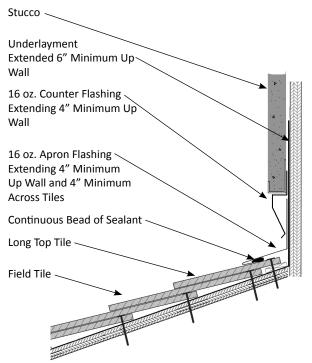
Counter Flashing & Apron Flashing at Head Wall
